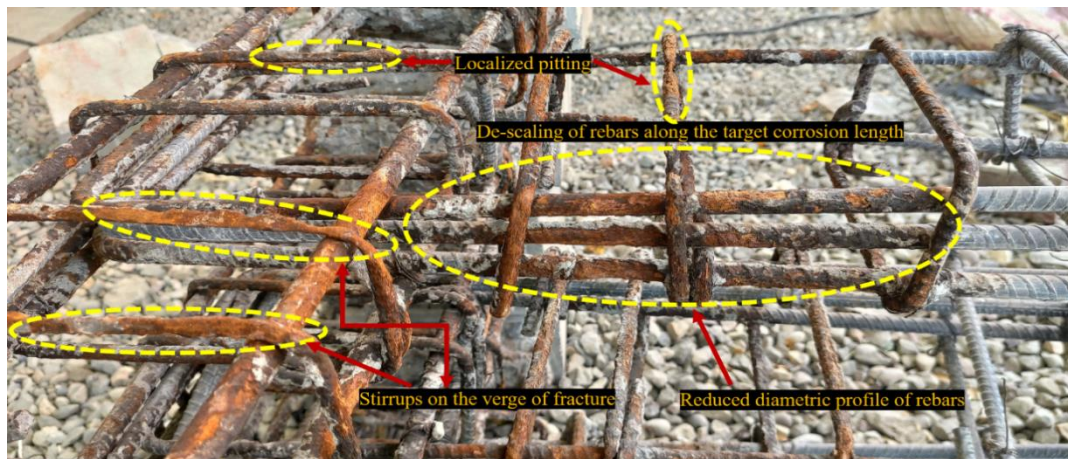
24 The fracture, localized pitting of stirrups, de-scaling, and cross-sectional reduction of longitudinal bars due to severe corrosion
